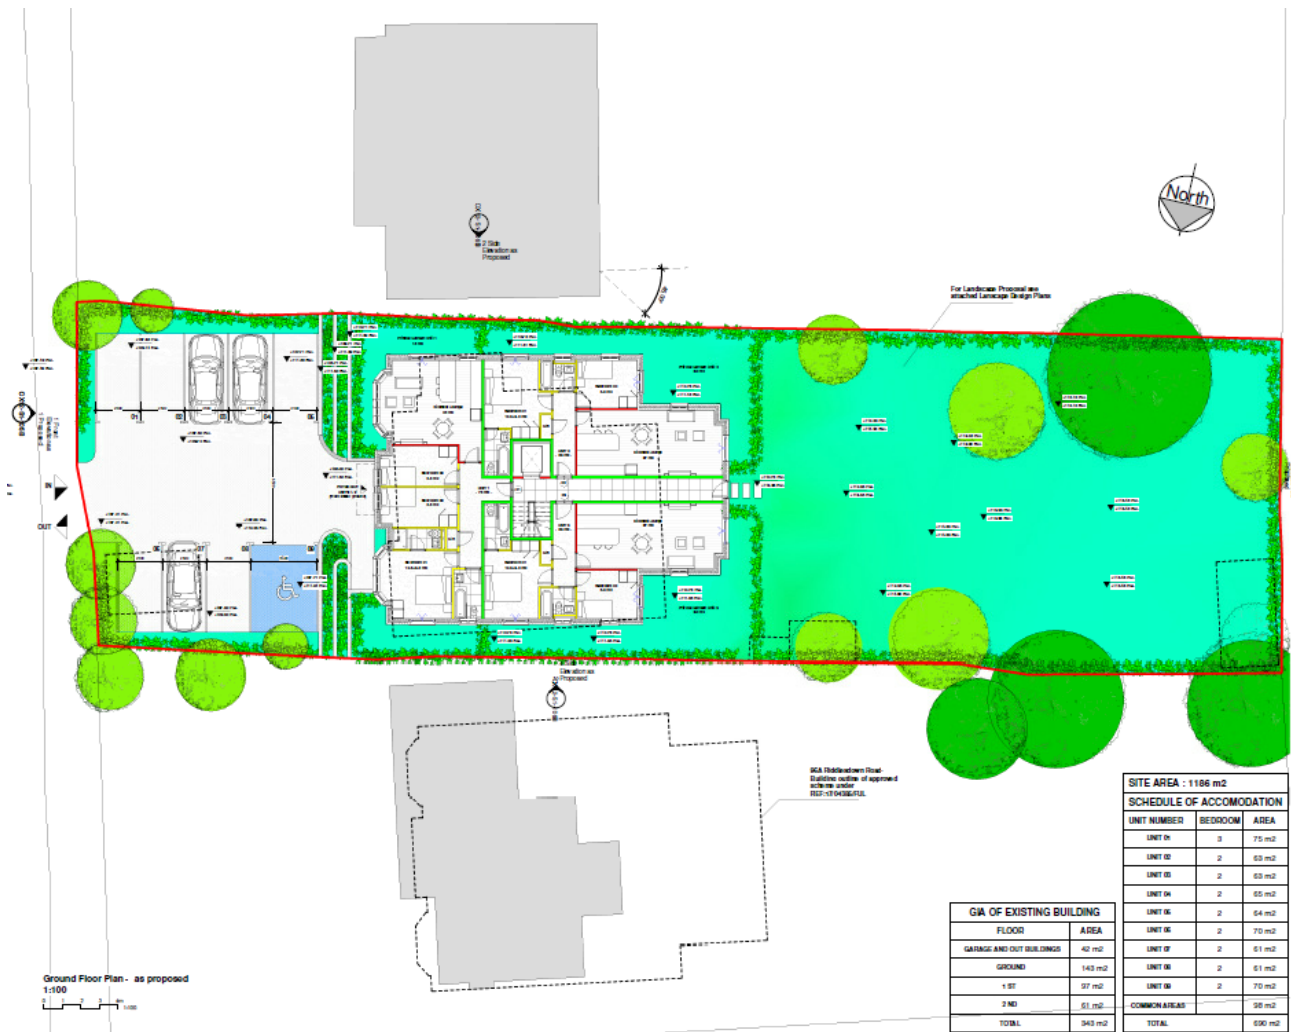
Ground floor plan proposed site showing proposal in relation to neighbouring properties
